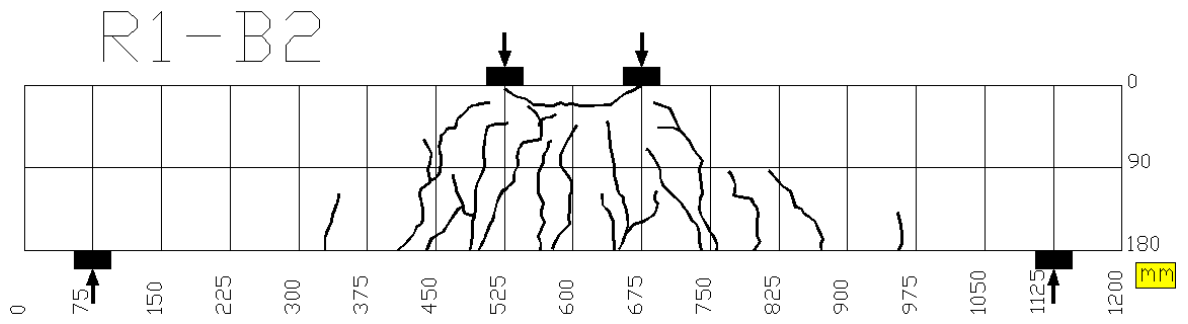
Crack Pattern for Beam (R1-B2) At Failure
